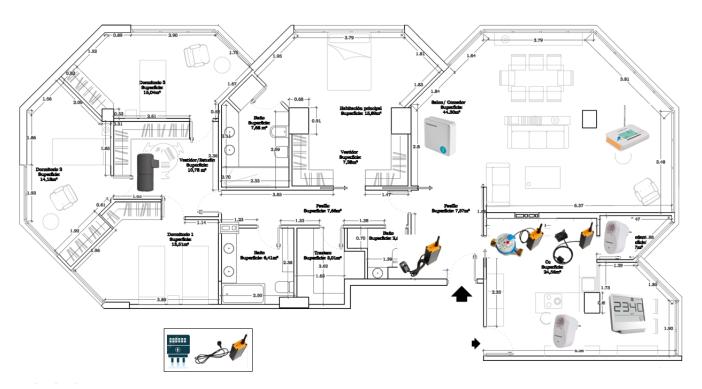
2D plan of the Madrid houses and devices deployment plan
